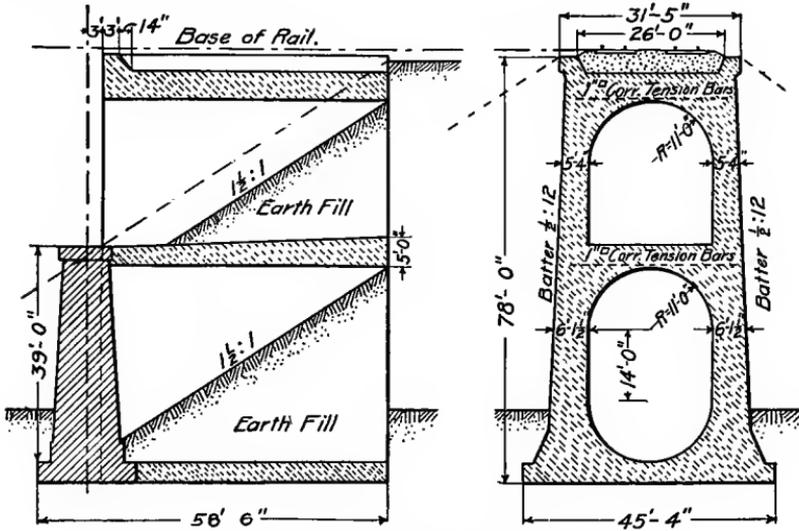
T ABUTMENT WITH LONGITUDINAL ARCHES.
